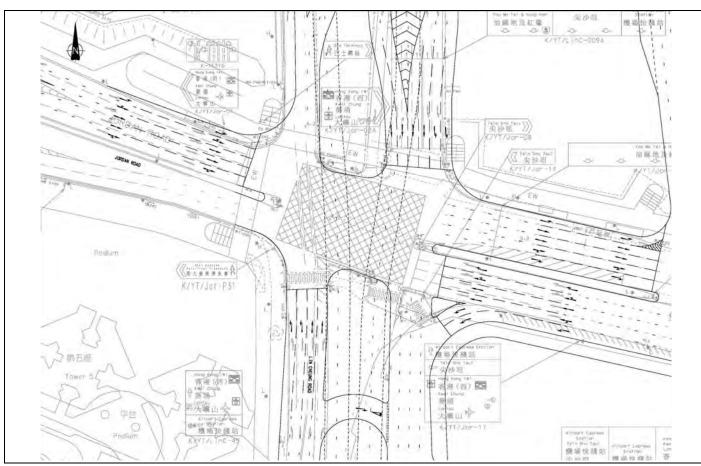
Planned Junction Layout of Lin Cheung Road/Jordan Road (J11)
